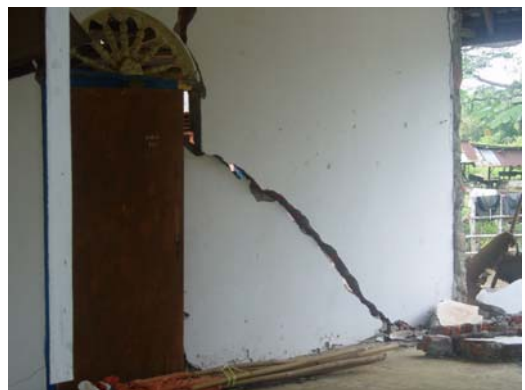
Diagonal cracks in walls due to out of plane loading
